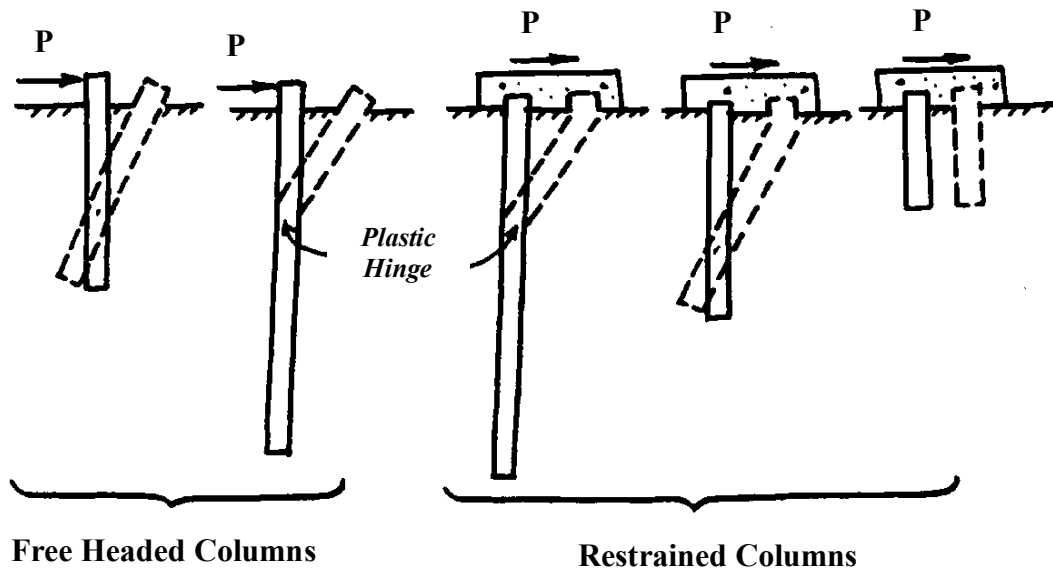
Failure Mechanisms of Laterally Loaded Piles (after Broms, 1965)
